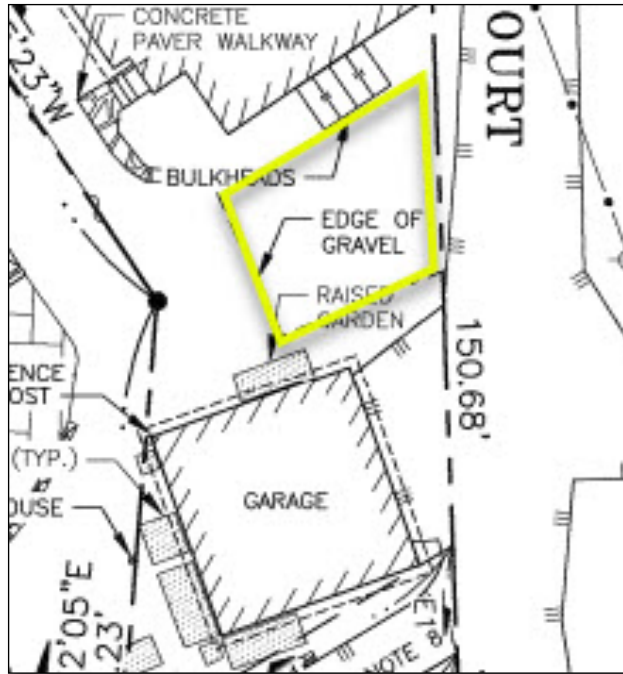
Inset from boundary survey showing location of existing off-street parking (in addition to parking in garage, also shown); this area is roughly 400 sf covered in gravel. Parking would not be impacted by proposed changes.
